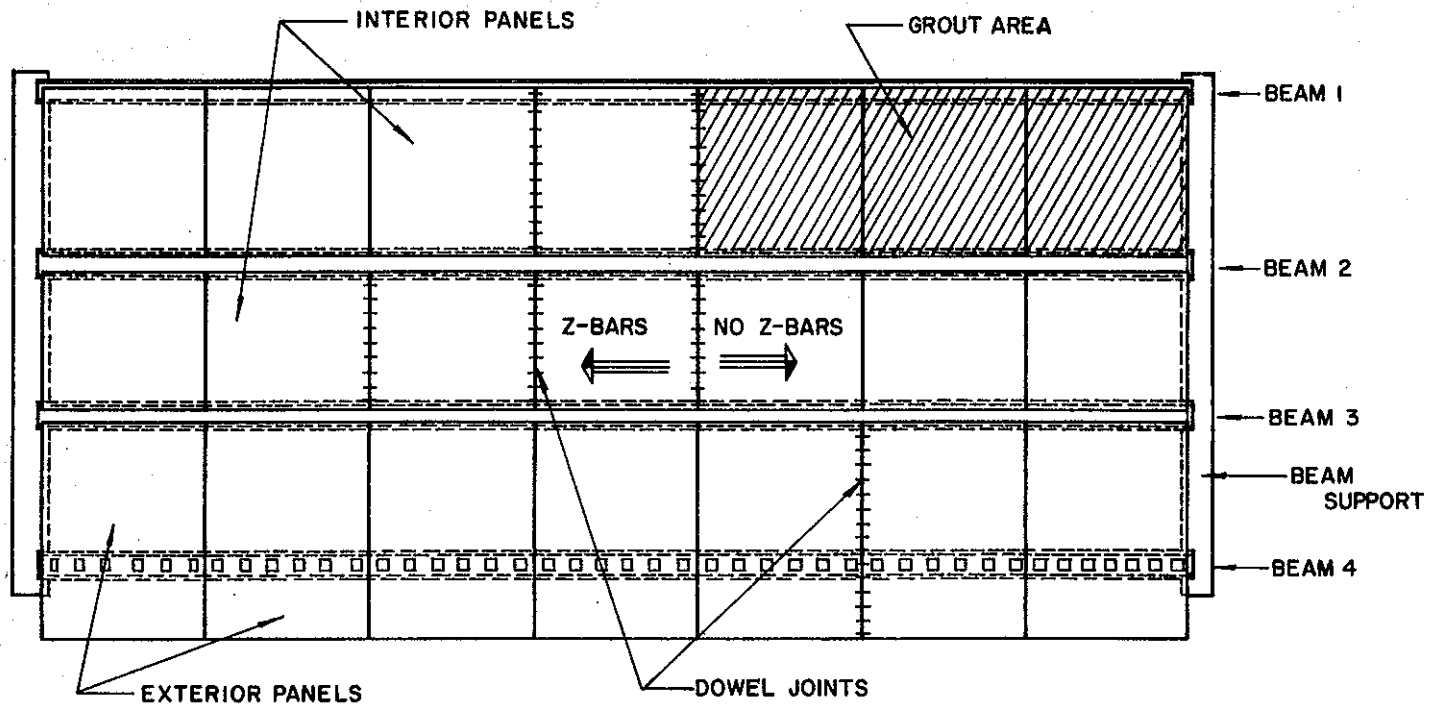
Location and Identification of Various Structural Details in Full-scale Bridge.
